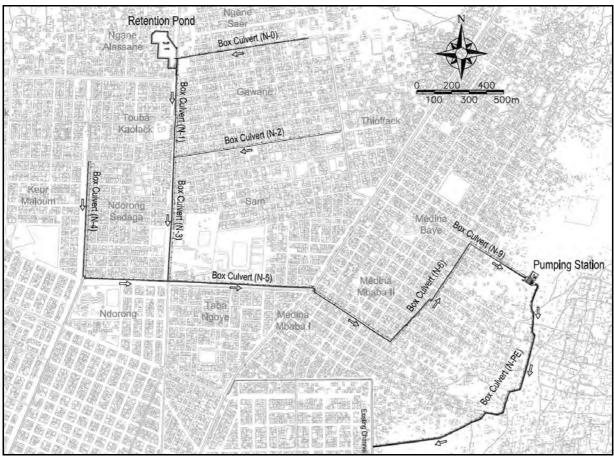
Locations of Proposed Drainage Facilities
